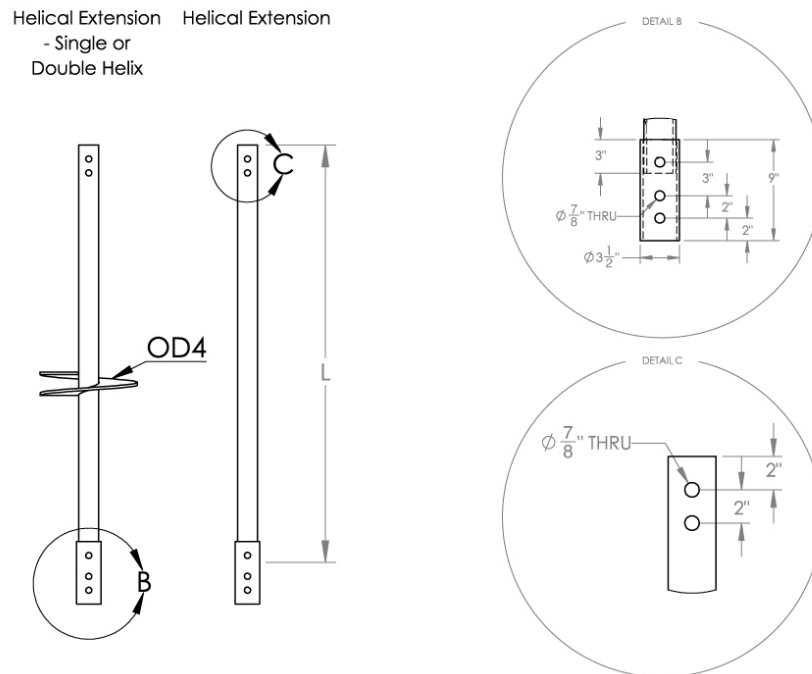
HELICAL PILE EXTENSION SHAFT – 601-28-S80-#-G
